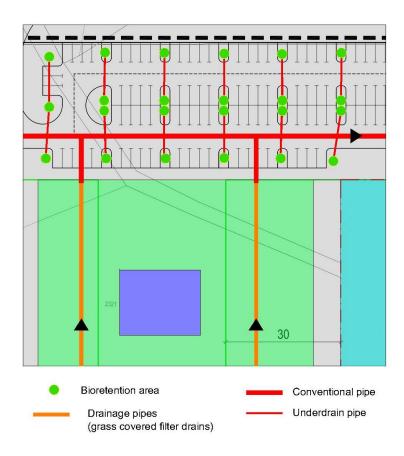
Bioretention areas with adjoining SuDS infrastructure
